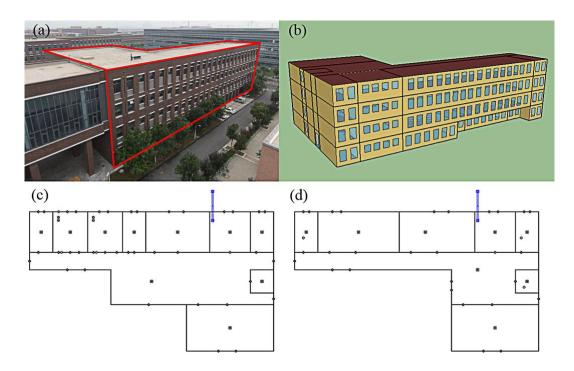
The layout of the model: (a) the actual building, (b) the simulation model, (c) the model's first- and second-floor plan, and (d) the model's third- and fourth-floor plan.
